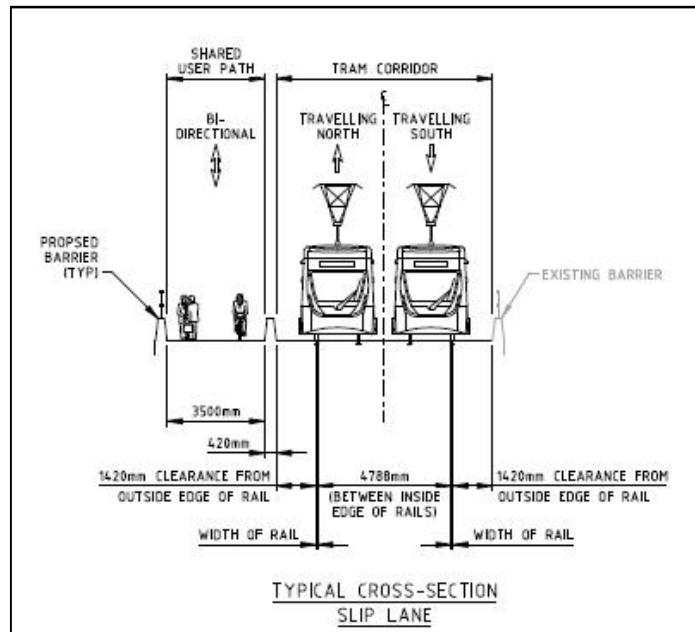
Potential tram connection configuration (two way) on Charles Grimes Bridge Slip Road
